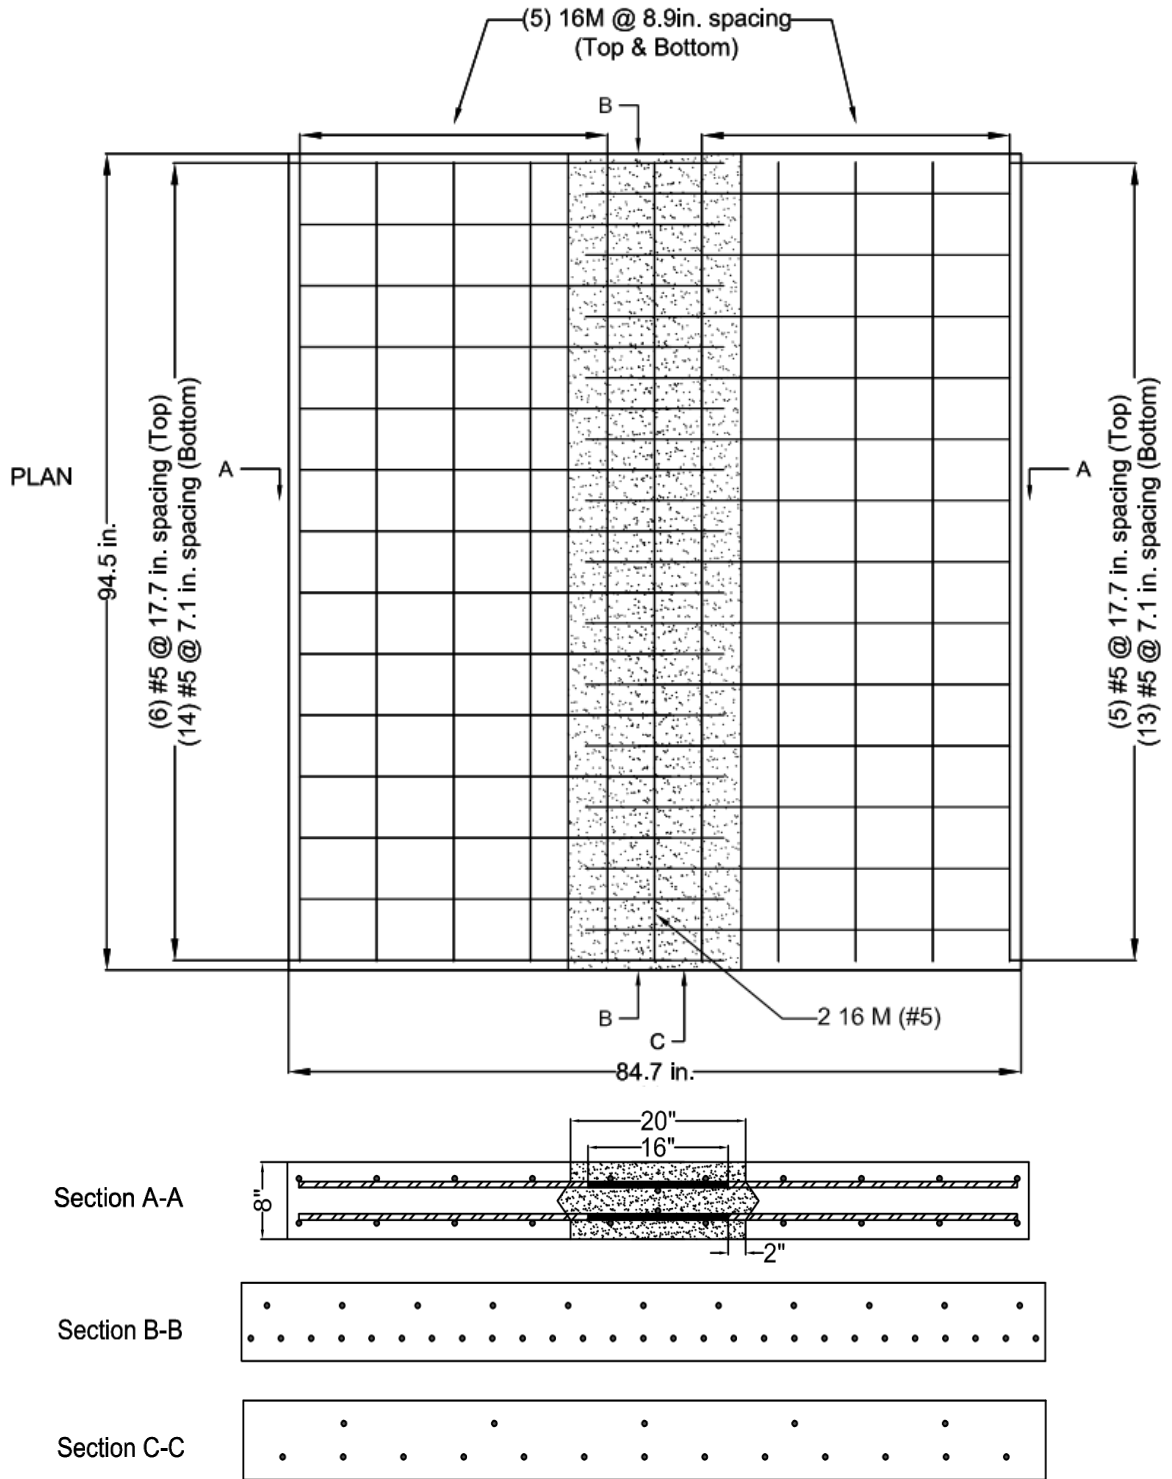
20-inch joint with straight bar details (Model S20)
